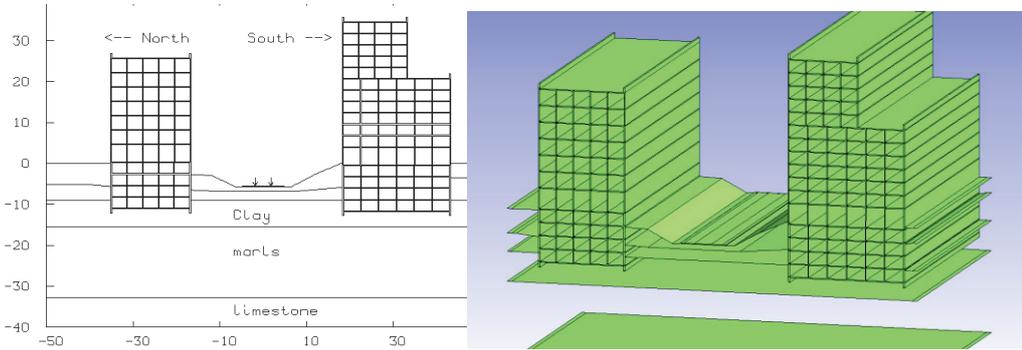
2D and extruded view. Two buildings close to a railway embankment.
